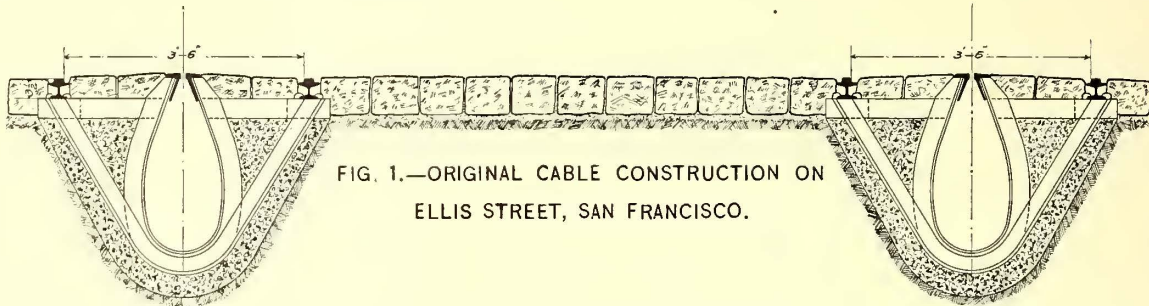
ORIGINAL CABLE CONSTRUCTION ON ELLIS STREET, SAN FRANCISCO.
